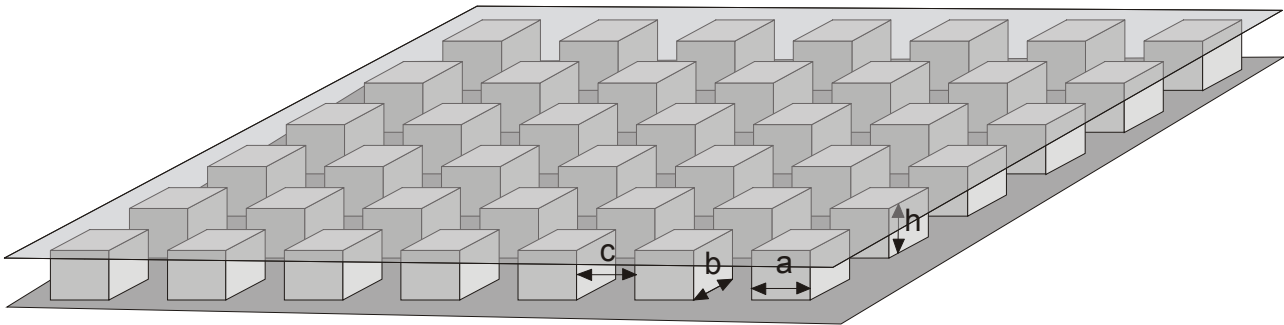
Schematic of the room-and-pillar mining layout showing, a: pillar width, b: pillar depth, c: room width and h: pillar height.
